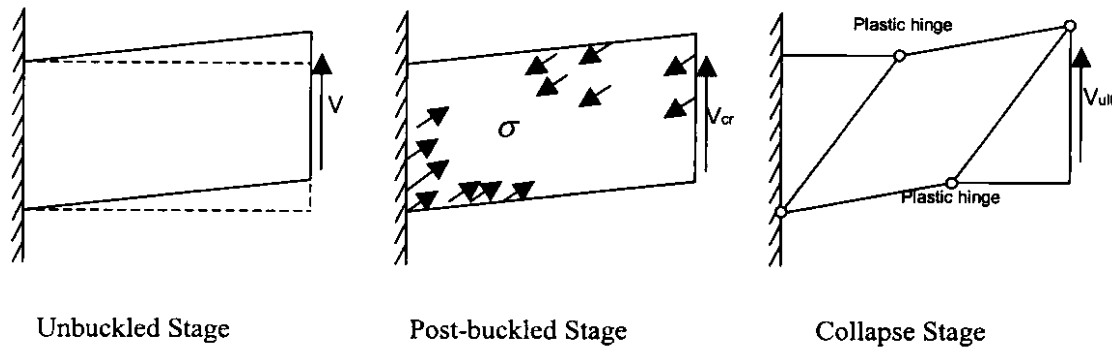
Collapse Mechanism for Plate Girders under shear (Porter et al, 1975).
